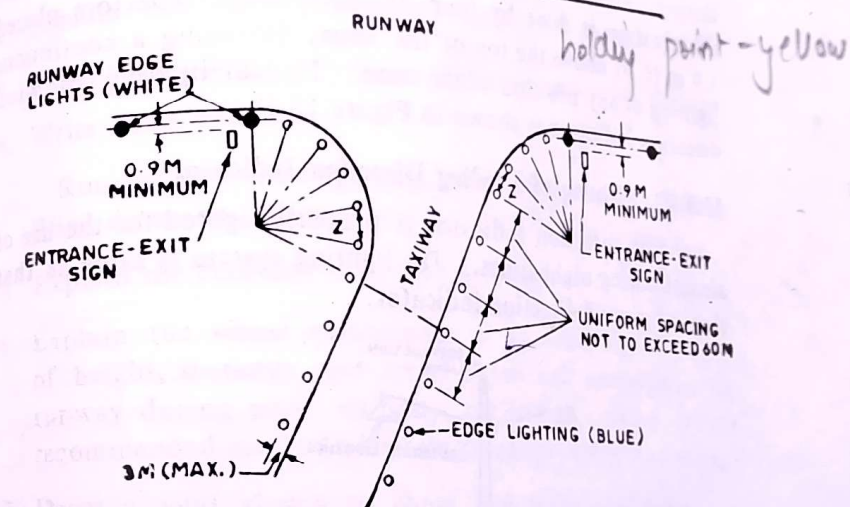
Typical Lighting Layout for a Taxiway Turn off from a Runway
